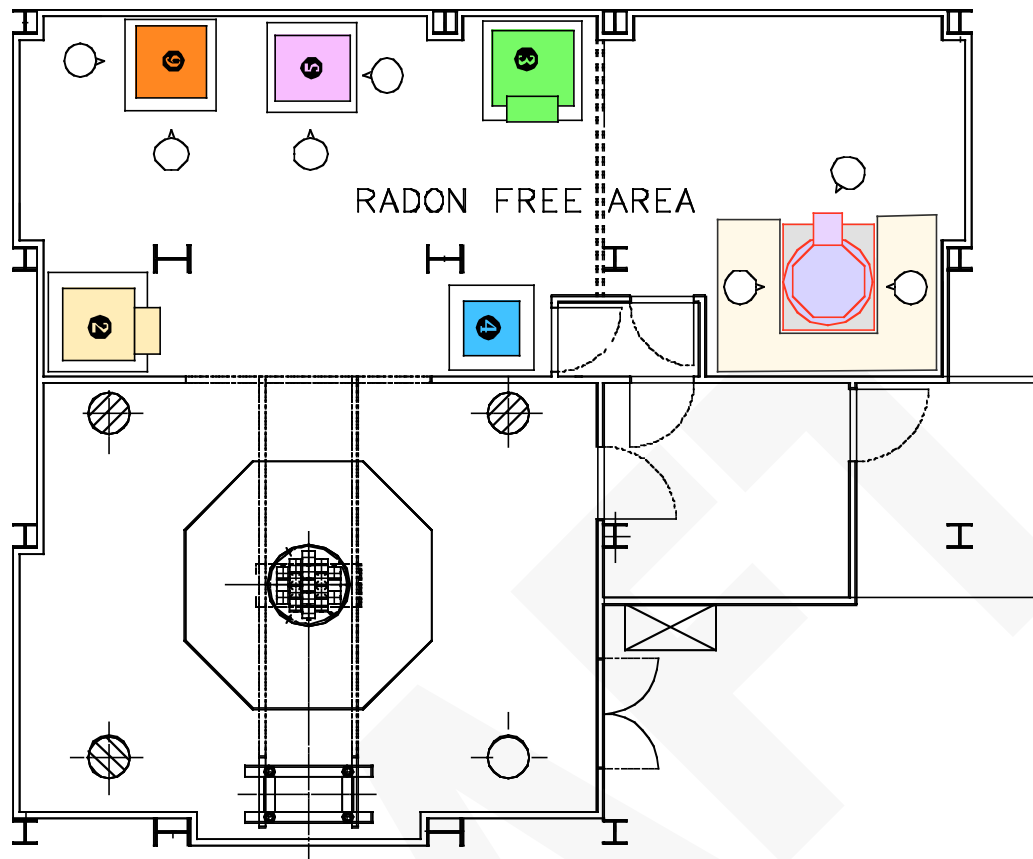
A possible arrangement of the assembly tools inside CUORE clean room
